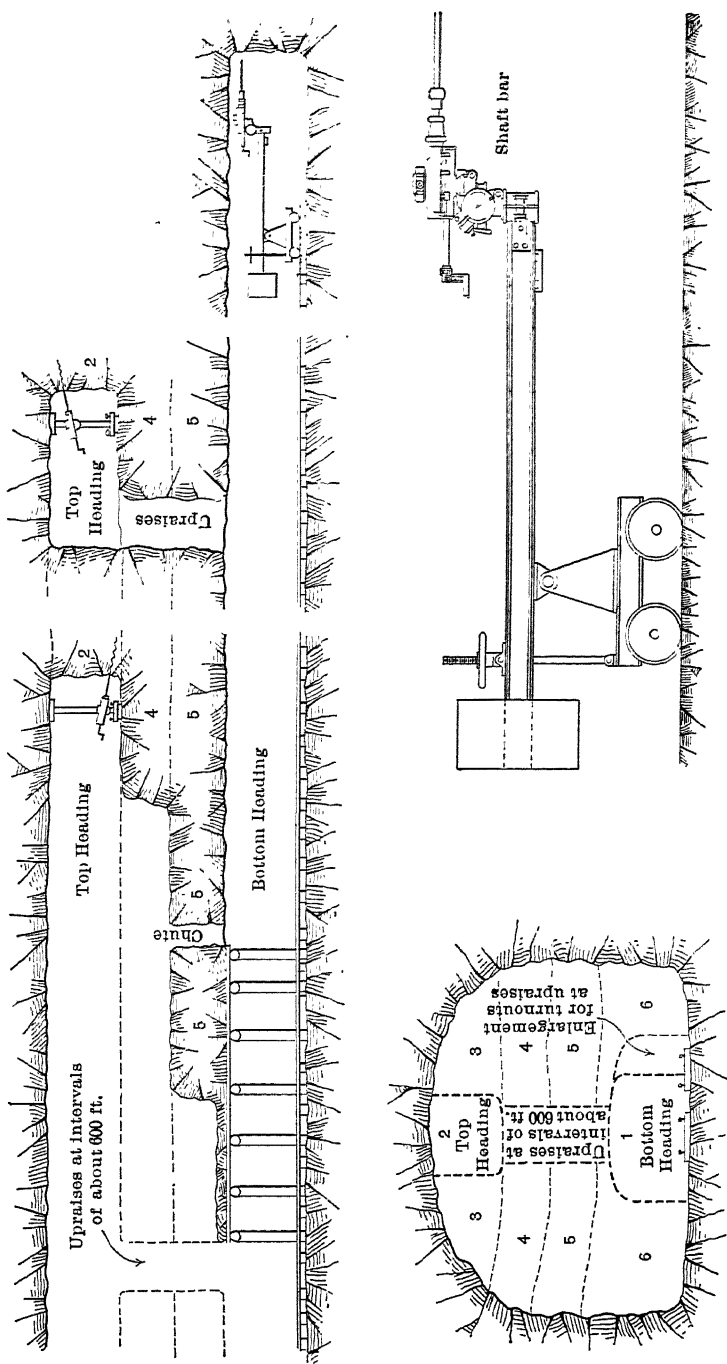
LONGITUDINAL AND TRANSVERSE SECTIONS OF LOETSCHBERG TUNNEL, SHOWING UPPER AND LOWER HEADINGS, UPRaises, CHUTES, ETC., AND DRILLS IN POSITION, WITH OUTLINE-ELEVATION OF CARRIAGE AS ACTUALLY USED IN THE HEADING.
